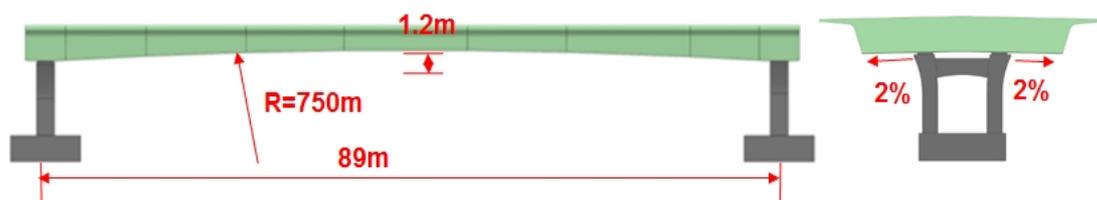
The construction layout of the L7 span of Dongfeng avenue freeway viaduct
